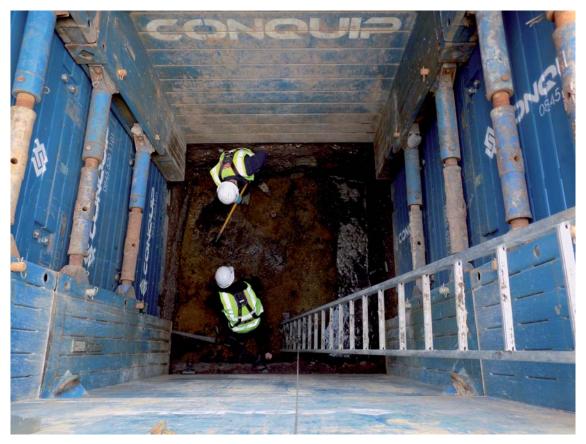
Photograph of the base of the quarry pit in Trench 1 within the trench box, looking north
